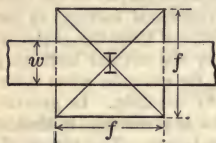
Square Supporting Area. Wall and Concentric Isolated Load
